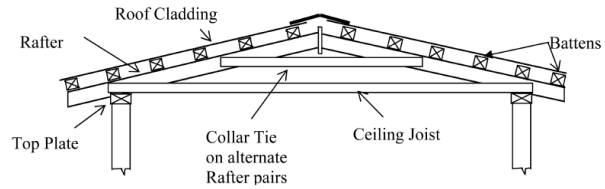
ROOF STRUCTURE OF THE GROUP 4 HOUSE
